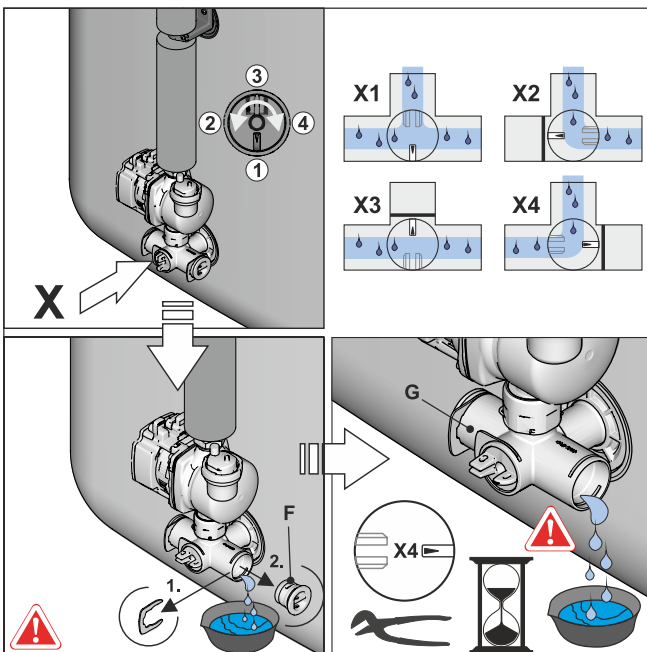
Shut off the valve insert, remove the blind plug from the connection bracket
